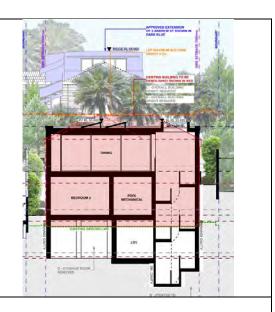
Section B showing location of lift overrun and PV panels, Source: MHNDU
